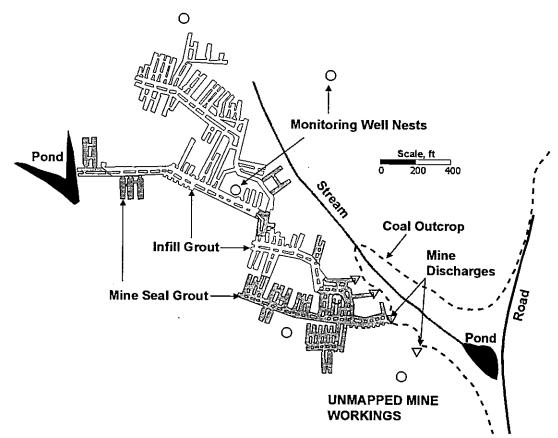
Injection of Fixated FGD Grout at Roberts-Dawson Mine Site
